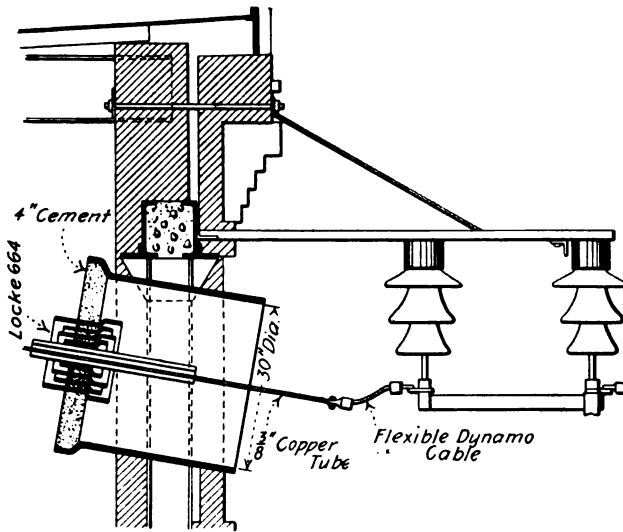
NIAGARA, LOCKPORT AND ONTARIO POWER CO. DETAIL OF HIGH-TENSION OUTLET THROUGH WALL
